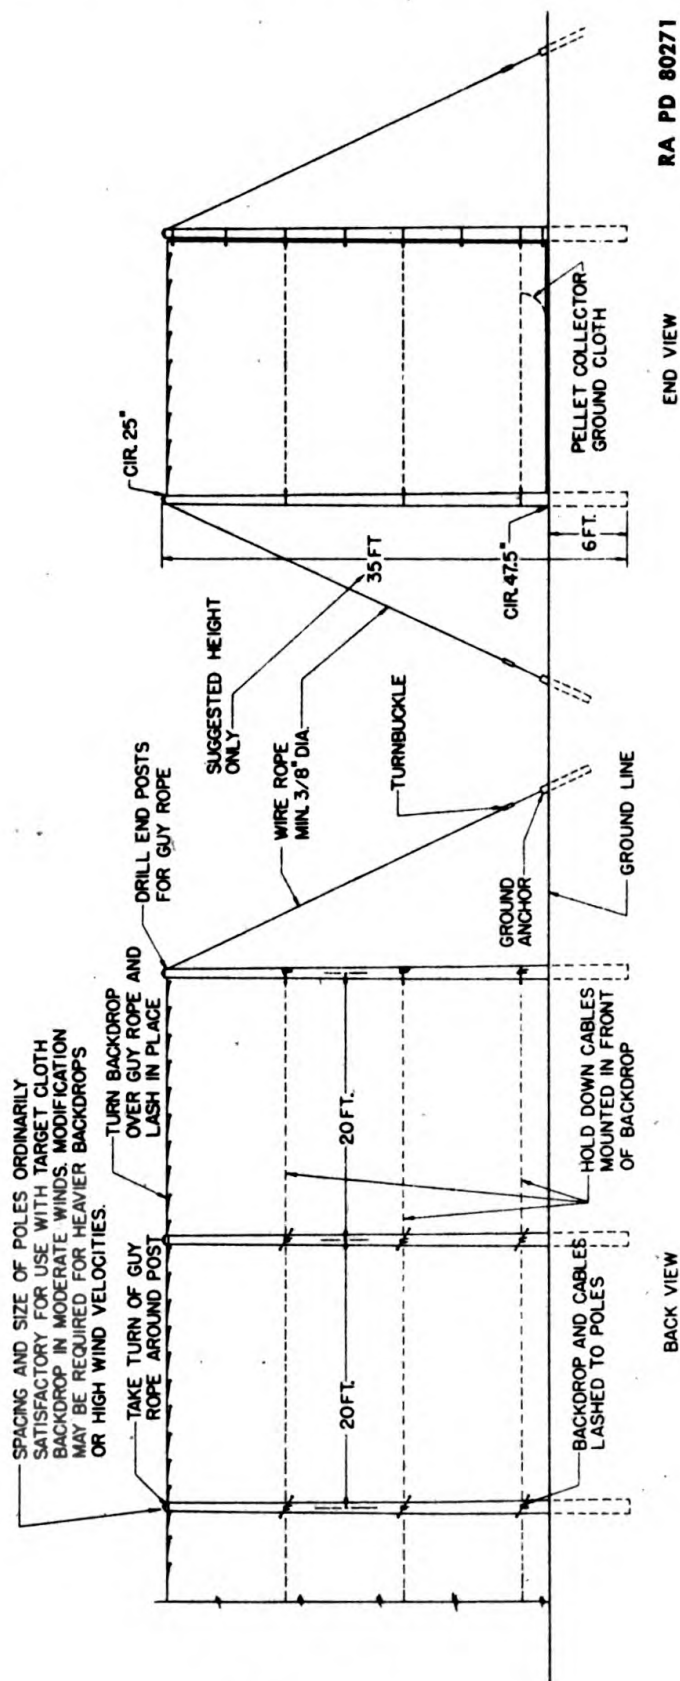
Corner of Outdoor Back Drop — Alternative No. 2 — Back and End Views
